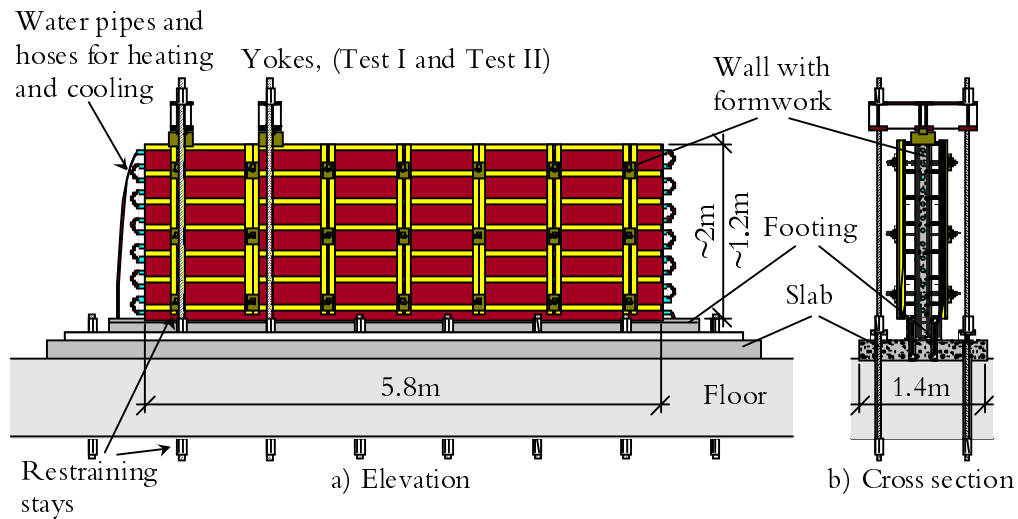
a) Elevation and b) cross section of the walls, footings and the slab of the four tests, Test I - IV. The yokes loading the wall on the top were only used in Test I and Test II. In Test I and Test II, the wall was 2 m high, whereas in Test III and Test IV, the walls were 1.2 m high.
